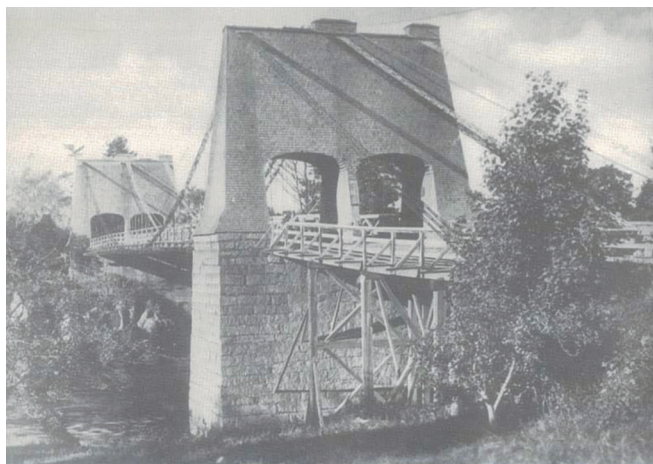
Newberry Port Bridge: This could be the model for Mino Bridge.
